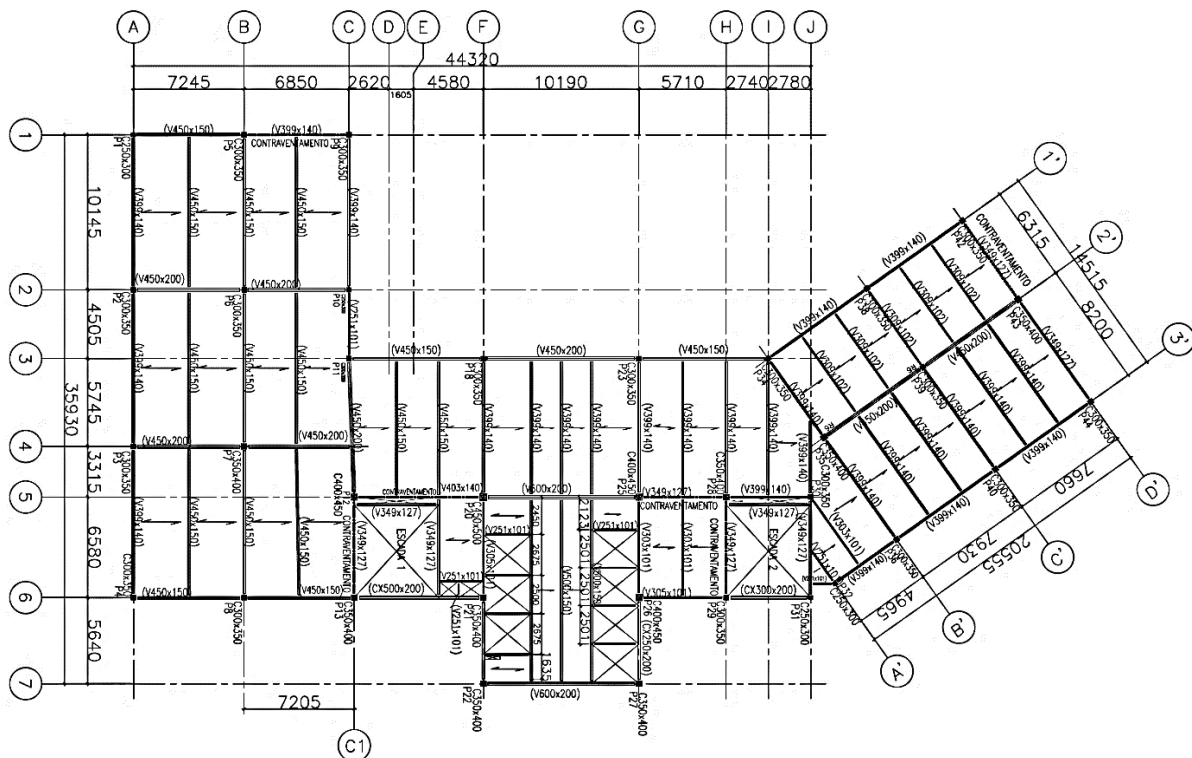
Investigated mixed floor (steel-concrete): 8<sup>th</sup> floor (dimensions in mm)
